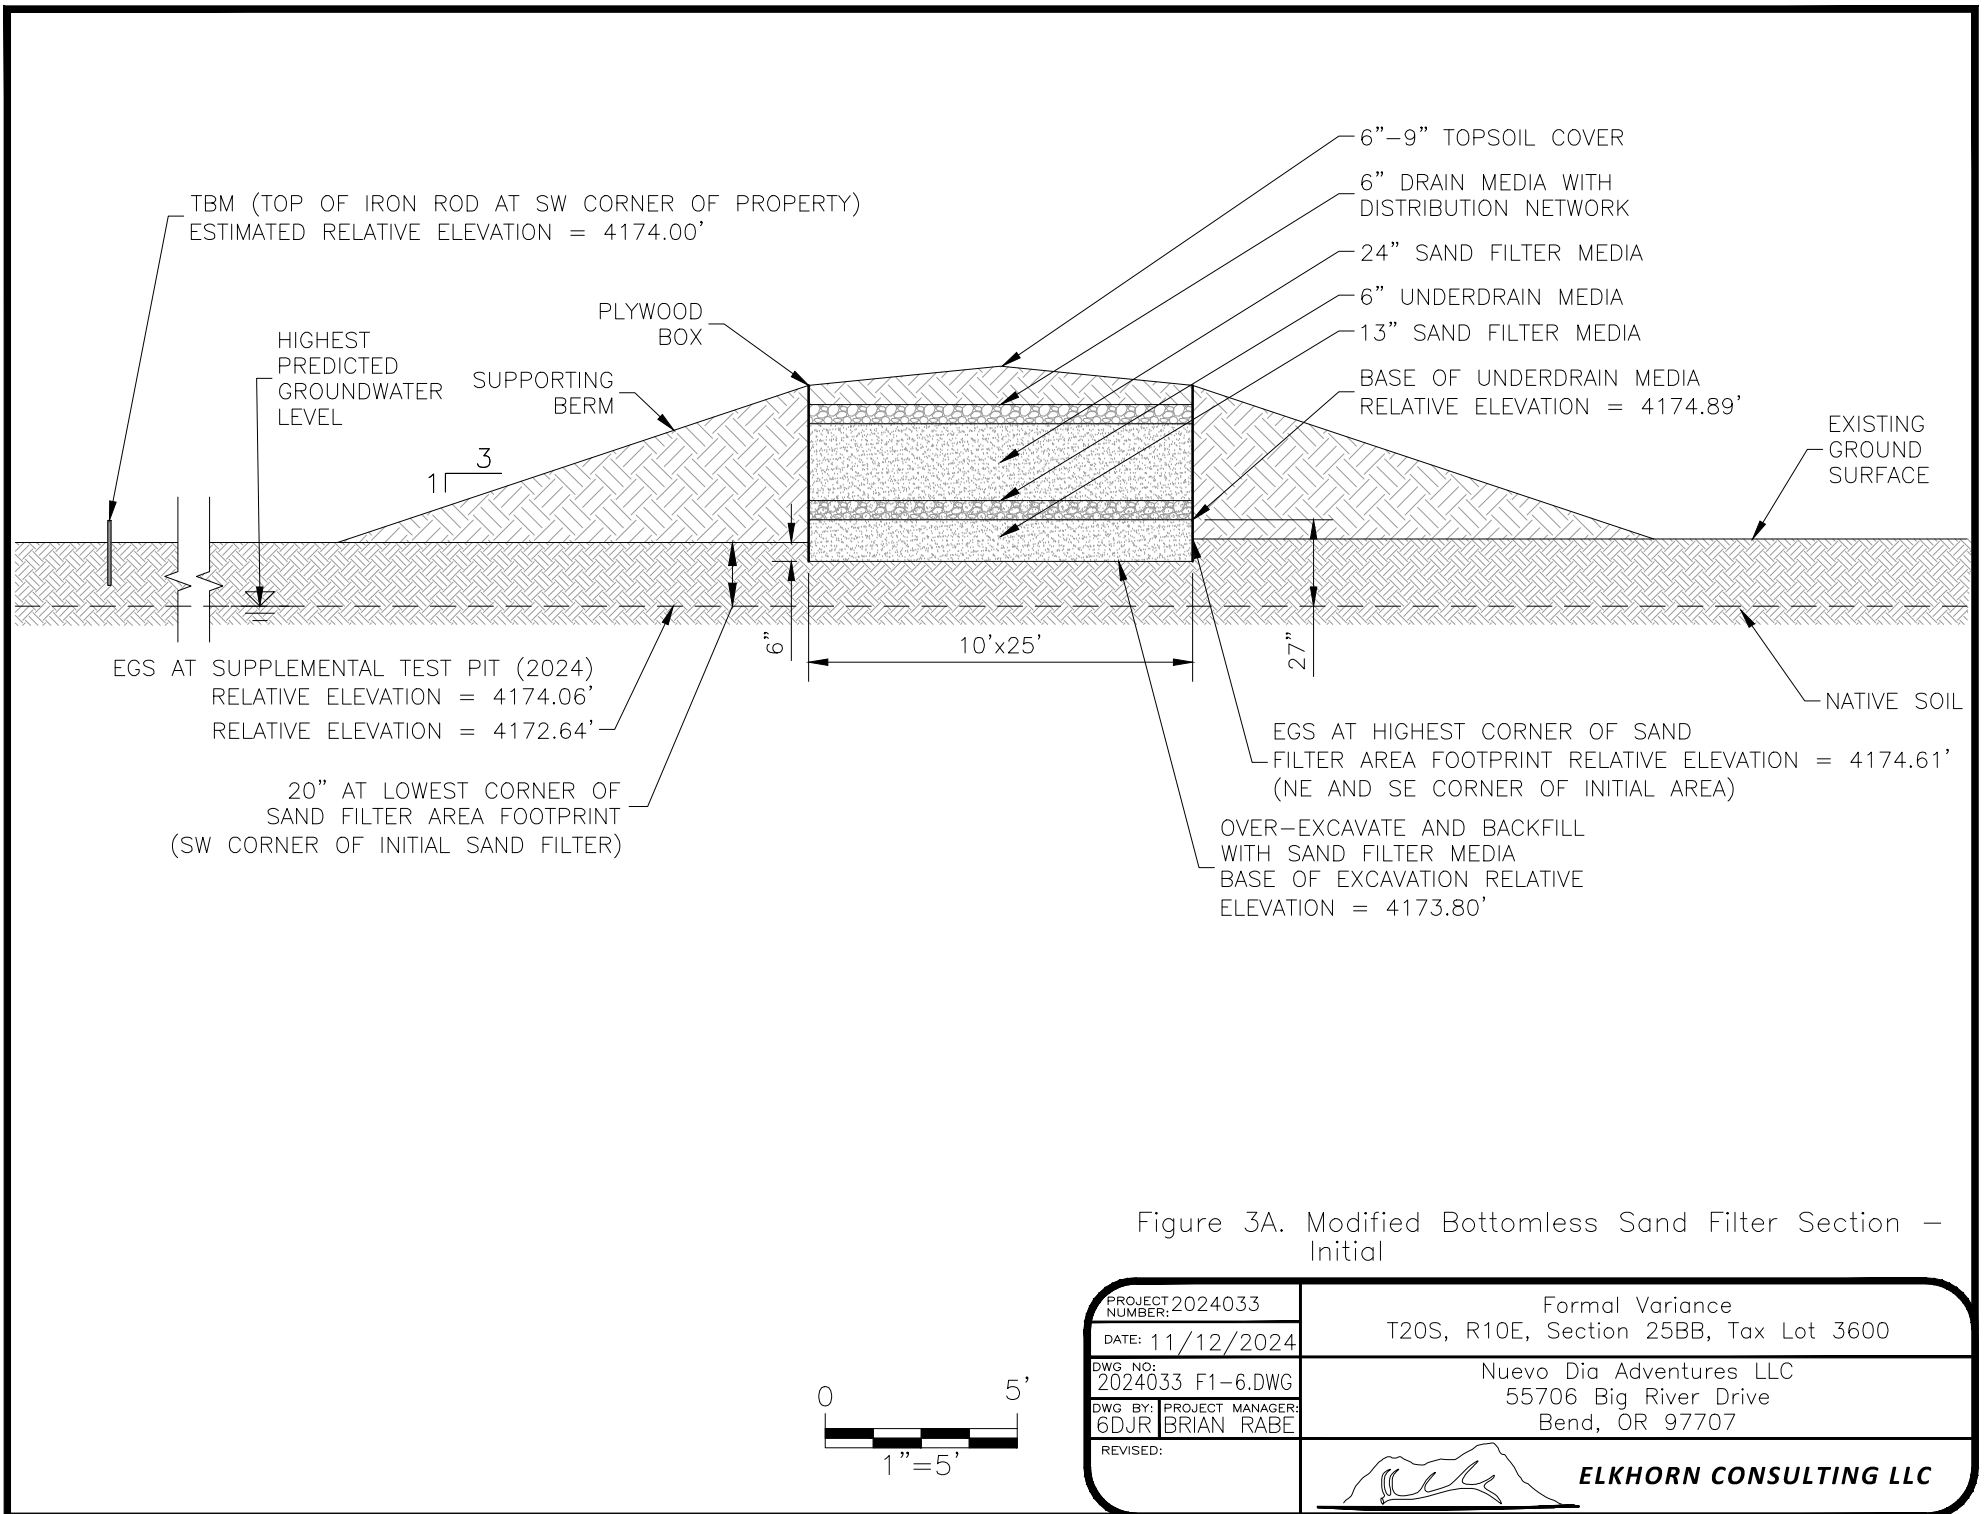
A. Modified Bottomless Sand Filter Section – Initial
